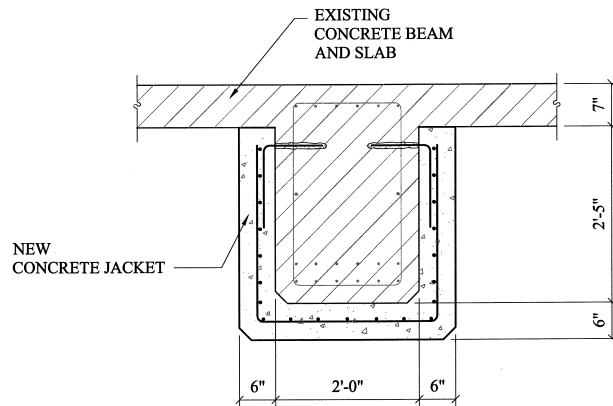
Strengthening of Post-tensioned Concrete Beam by Reinforced Concrete Jacket
